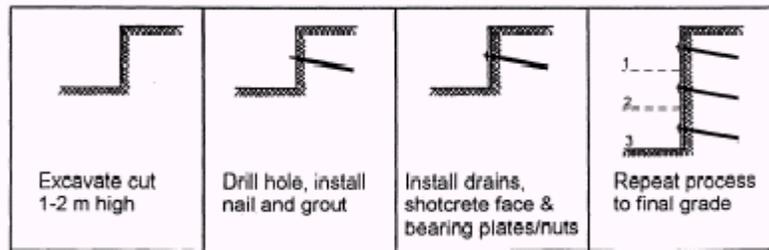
Soil Nailing for Excavation Support (after Walkinshaw and Chassie, 1994)
